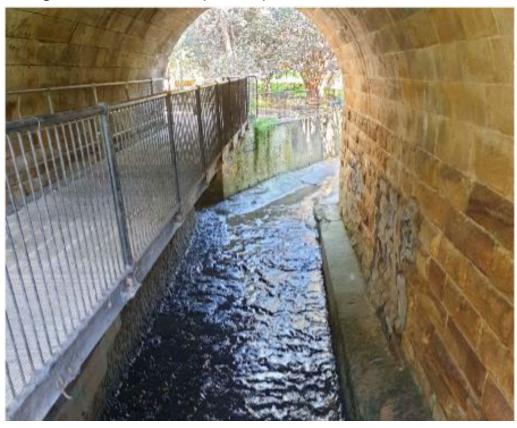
Example of a section of Flat Rock Creek classified as unlined underground under Willoughby Road bridge at Naremburn (FRC016)
